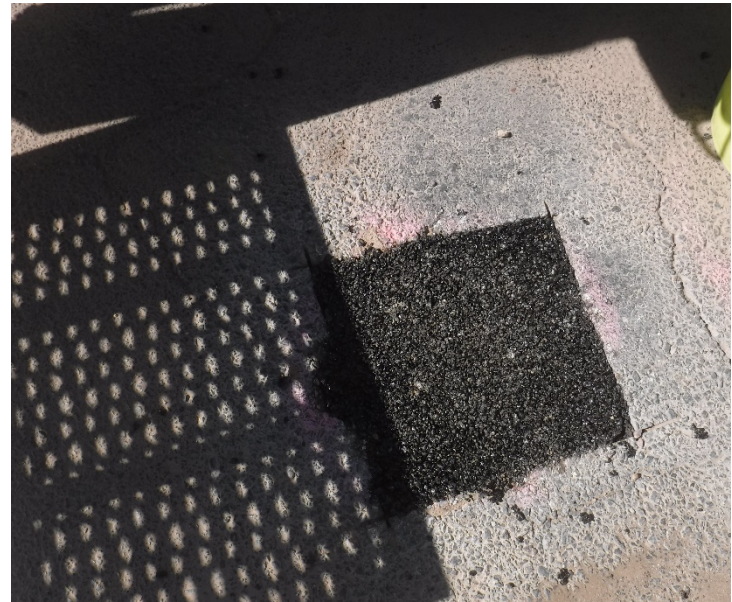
General view of asphaltic concrete patch at boring location.
